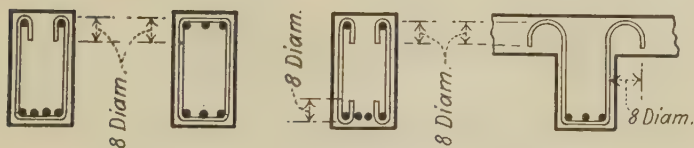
Typical Methods of Anchoring Vertical Stirrups.
